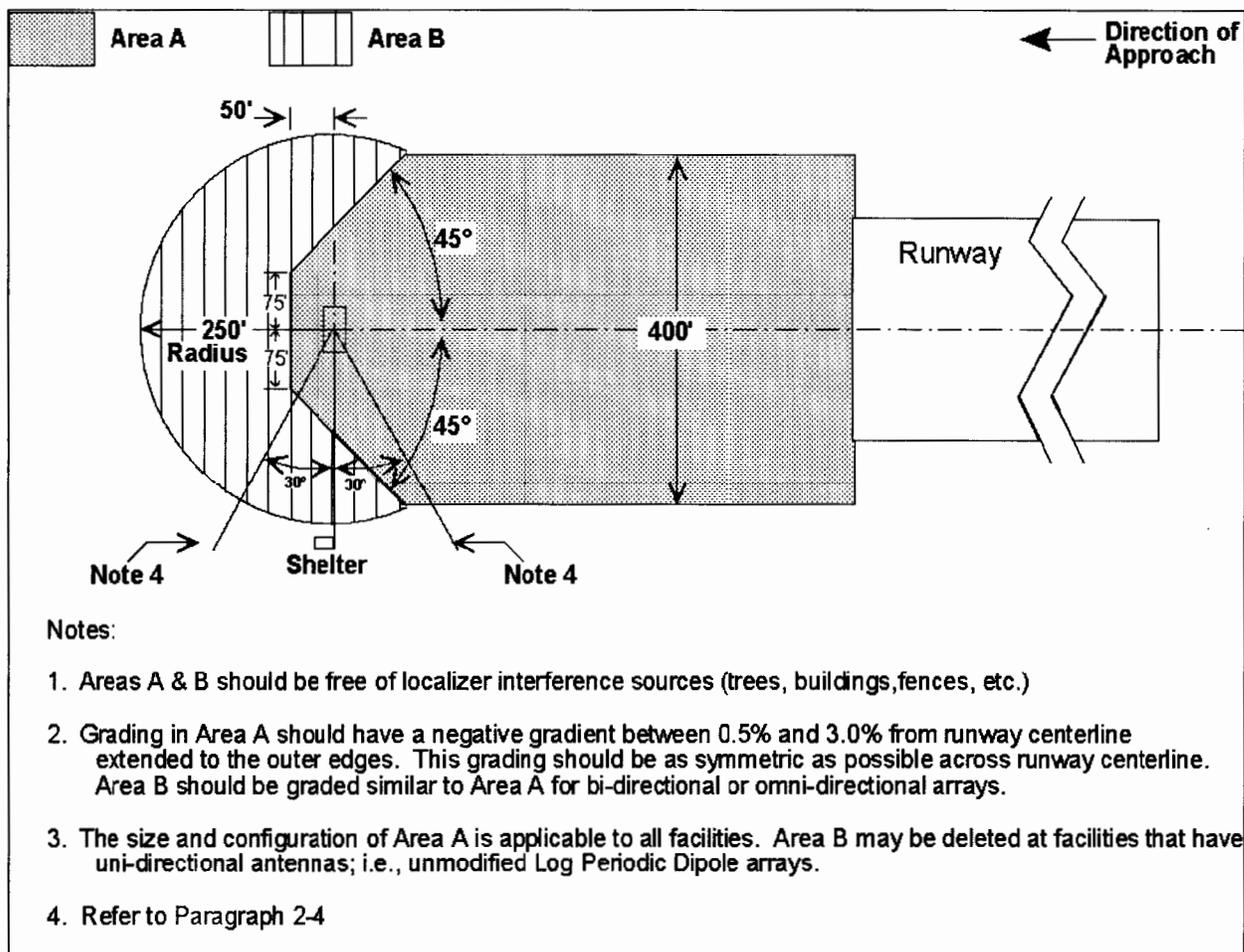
Typical Localizer Plot Layout and Site Grading Requirements
